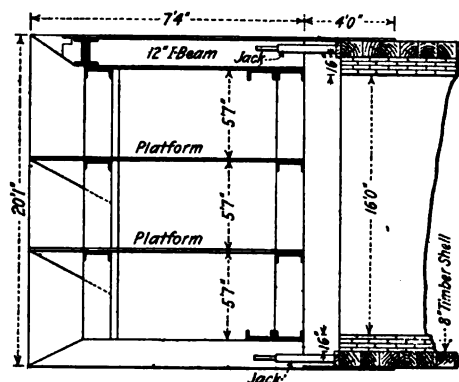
Section of tunnel shield and lining, Lawrence Avenue, Chicago.
